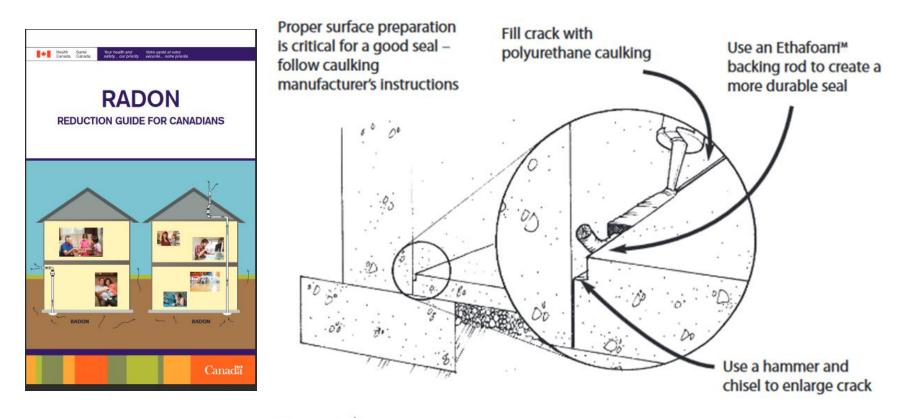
↑ Sealing foundation wall and basement floor joint.
